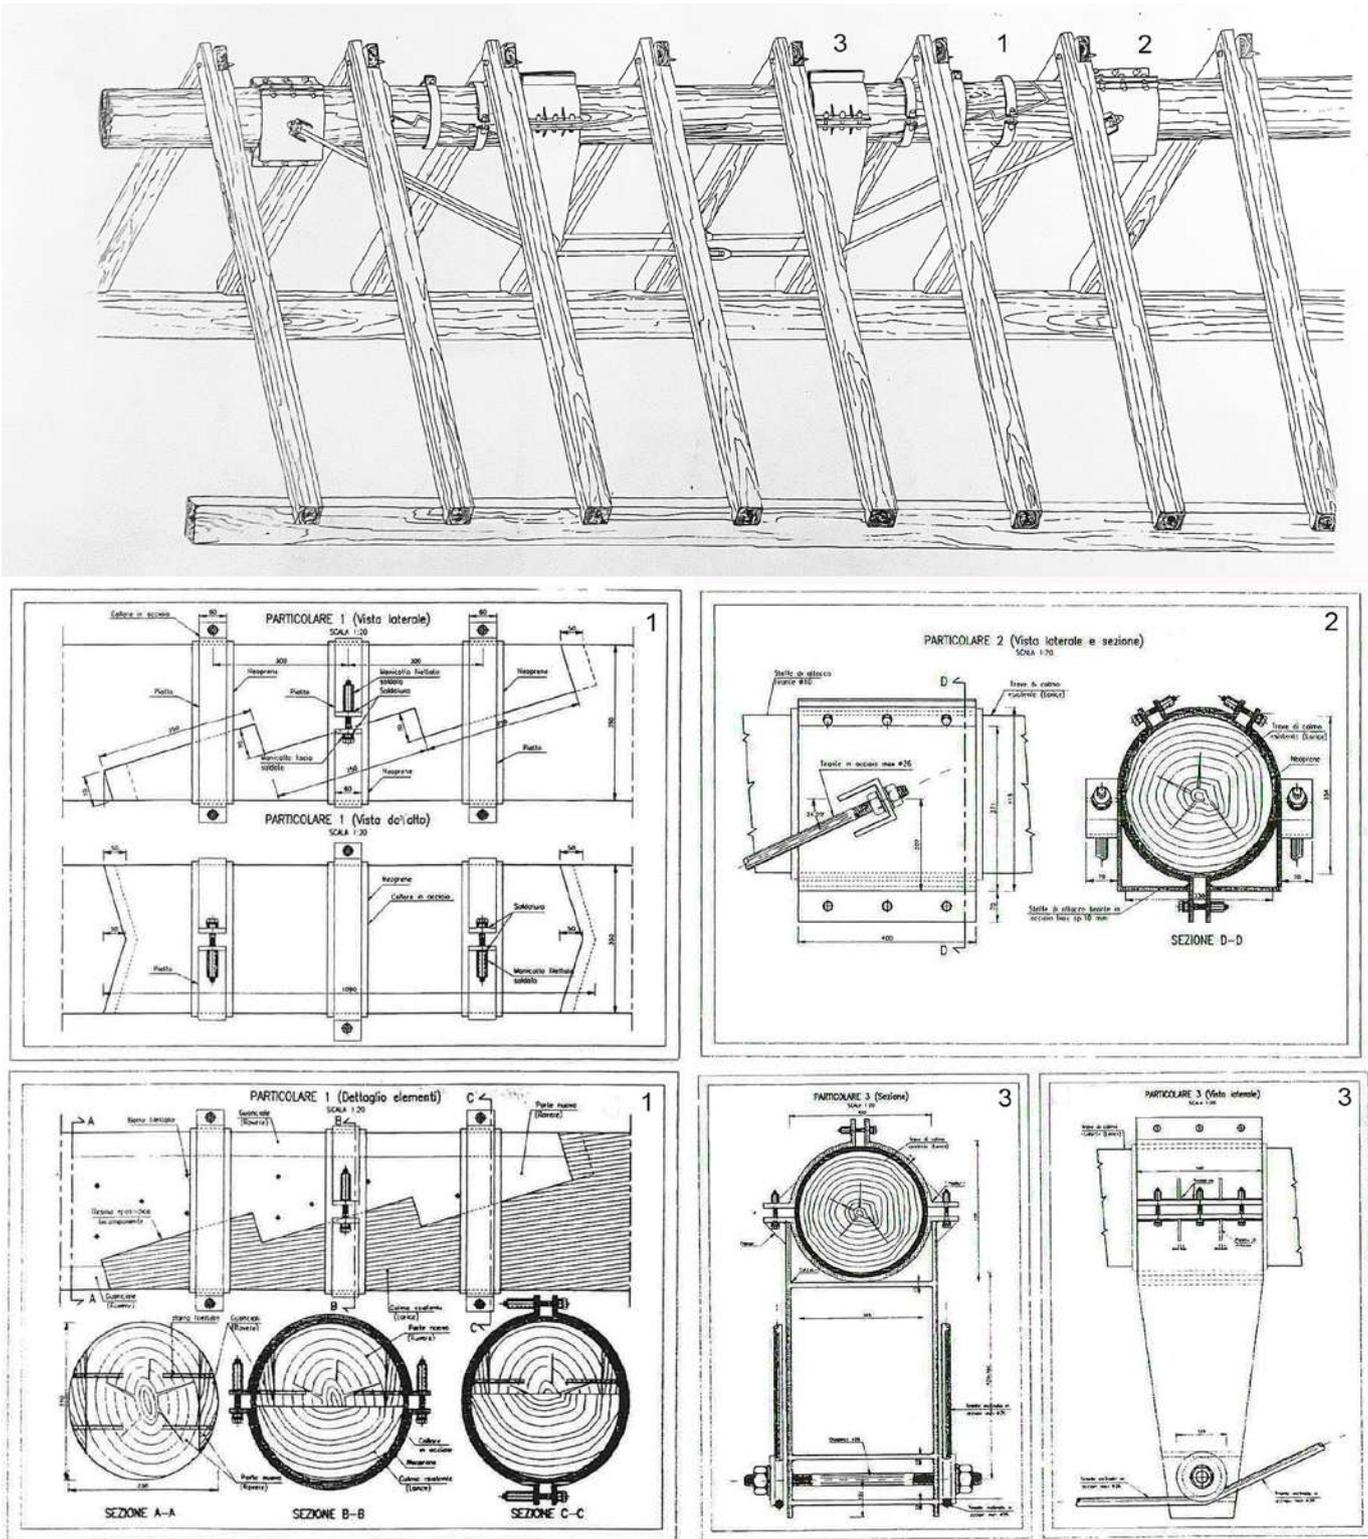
Church of Salbertrand. Reinforcement interventions on the ridge beam. General scheme of the interventions (on top); detail of the double “dart of Jupiter” joint, tightened by 3 bolted stainless-steel collars (1, on the right); and details of the stainless-steel tie rods and struts of the reinforced beam (2 and 3, on the left) system. (Image source: drawings courtesy of C. Bertolini-Cestari).
